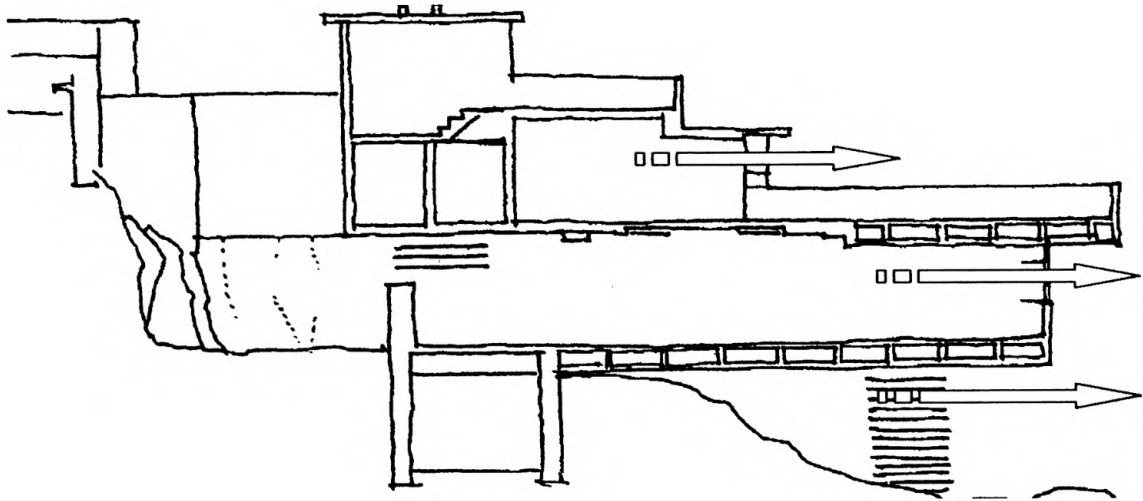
Fallingwater's flat concrete roofs generate an outward horizontal motion that opens up the building and engages it with its landscape. (Kaufmann, 1986, p. 73).
